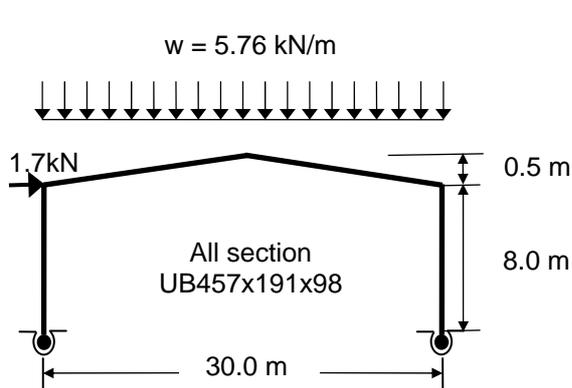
Details of single span frame after Song *et al* (Ref.2)
